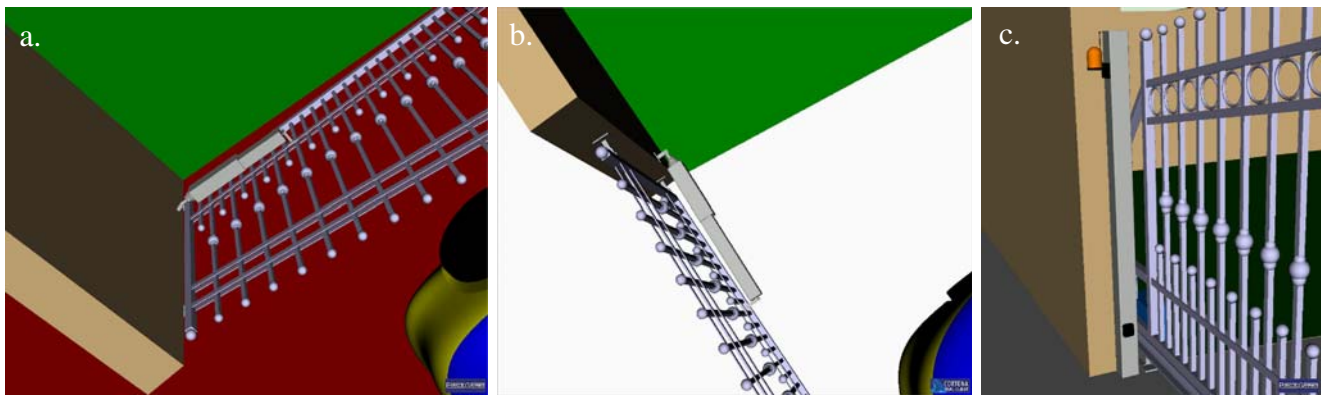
Detail snapshots (a opened, b closed gates and c slide gate detail)
